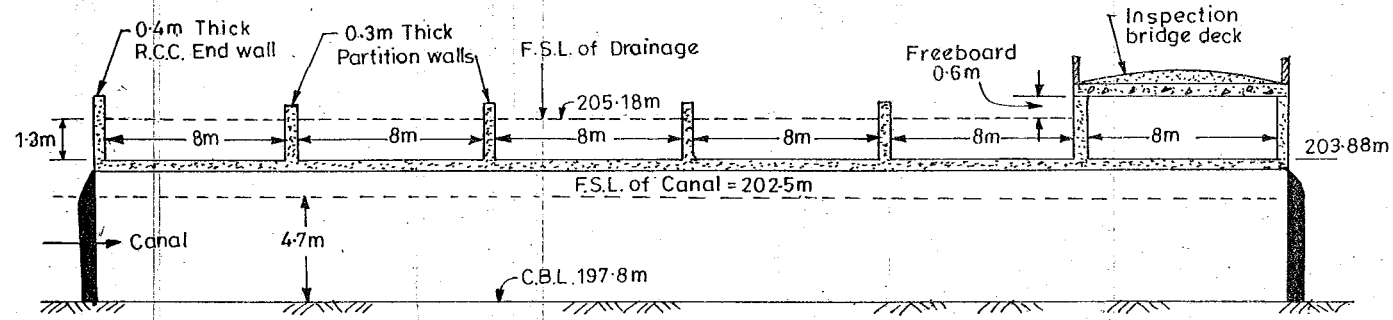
Section of Drainage Trough passing over the Canal
